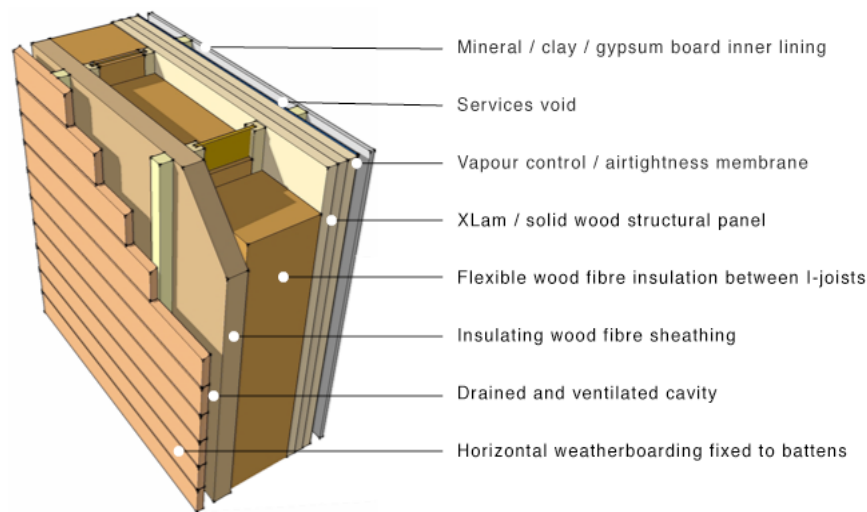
Possible wood panel wall renovation strategies (source: <https://www.greenspec.co.uk/building-design/woodfibre-xlam-wall/>)
